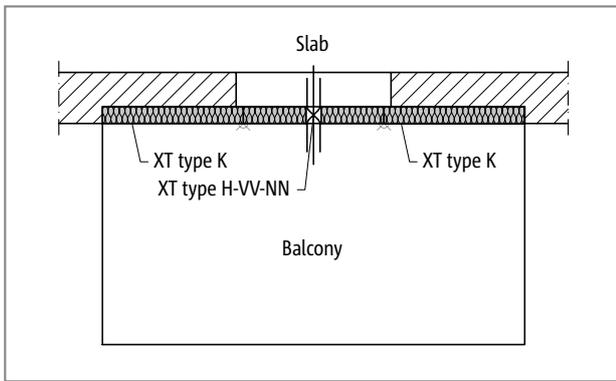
Schöck Isokorb® XT type H: Balcony freely cantilevered
